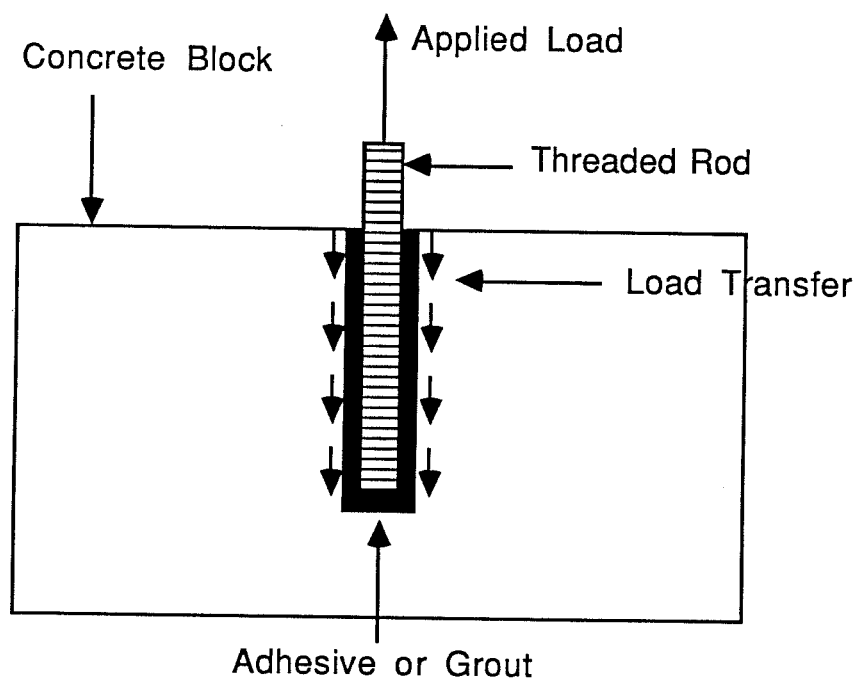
Load Transfer for Adhesive or Grouted Anchors
